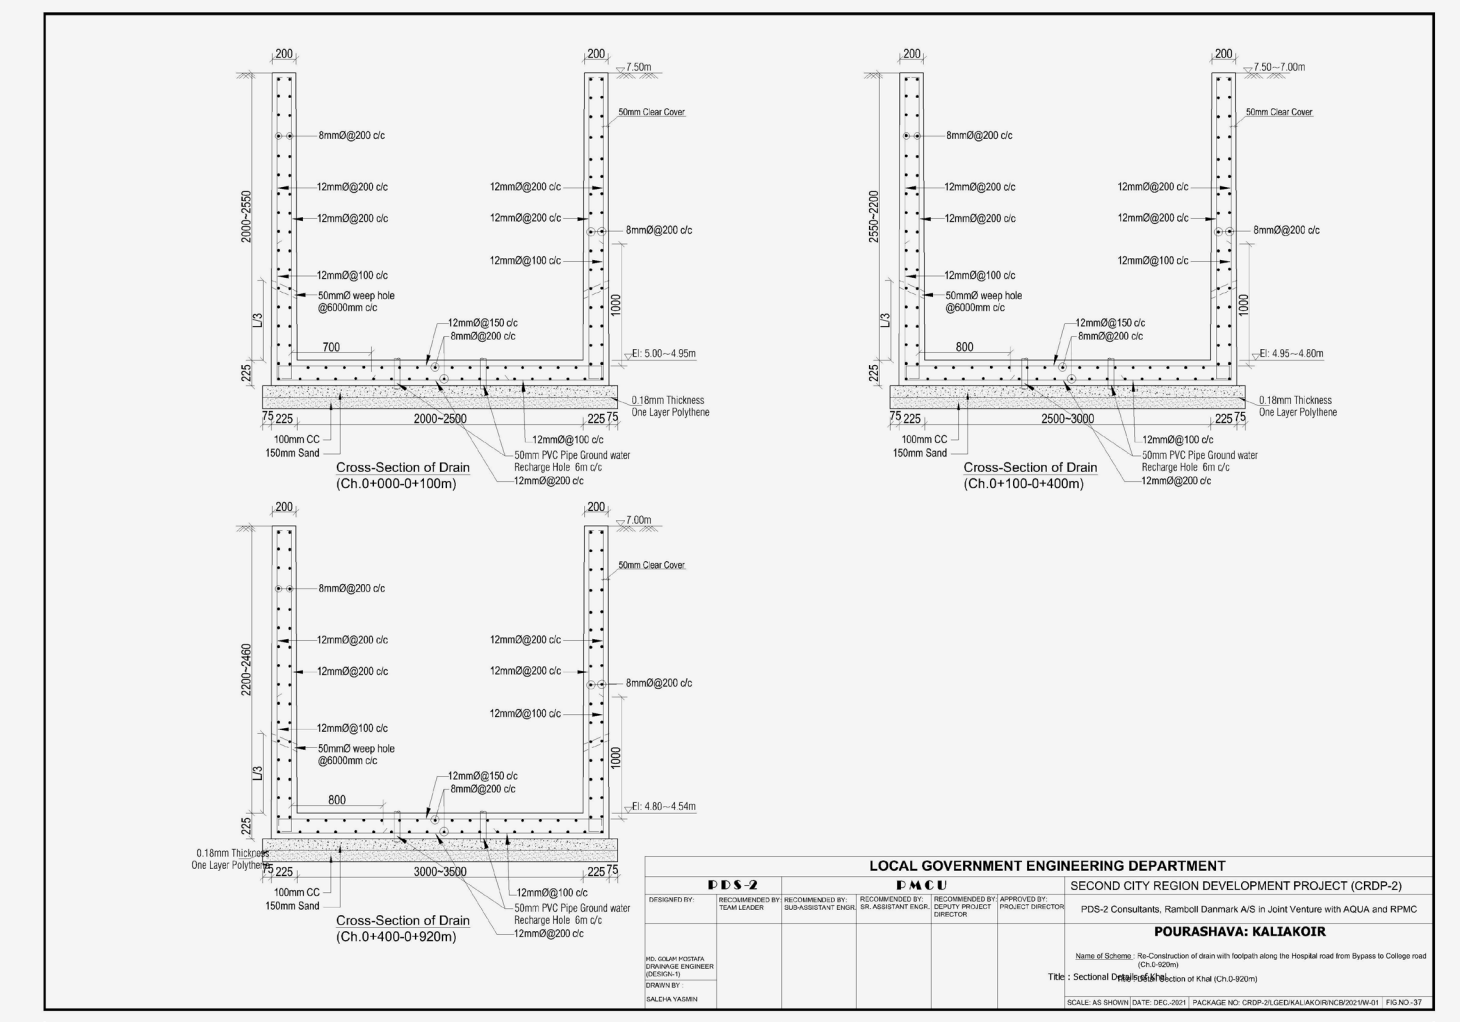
Cross section of Re-construction of drain with footpath along the Hospital road from Bypass to College road (Ch.0-920m).
